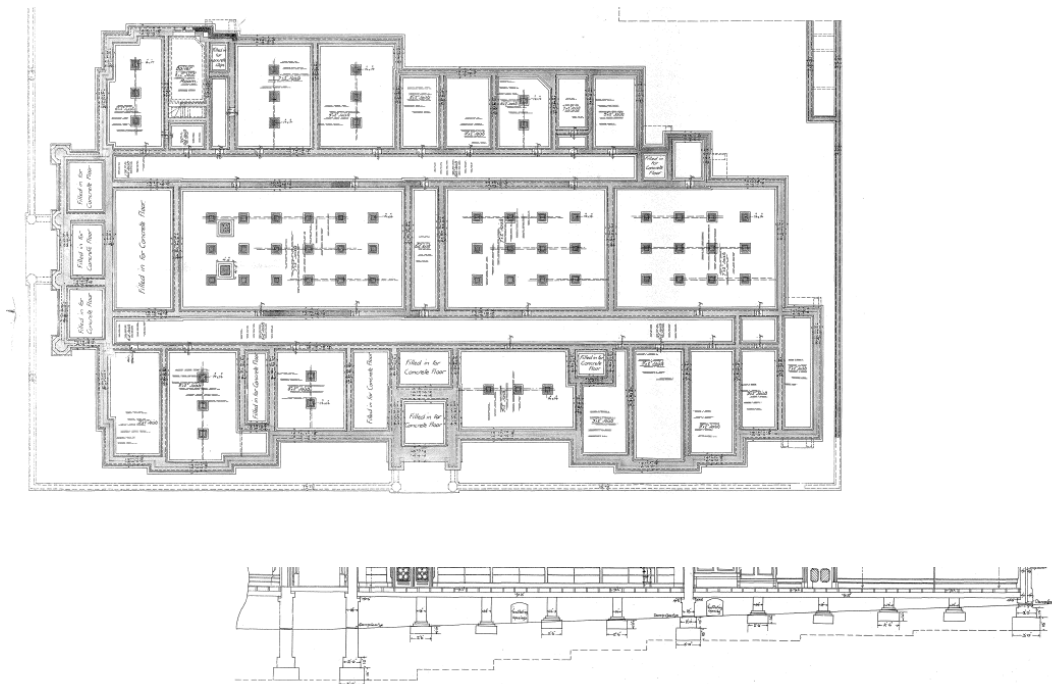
Original drawings showing plan and cross section views of the existing foundations
